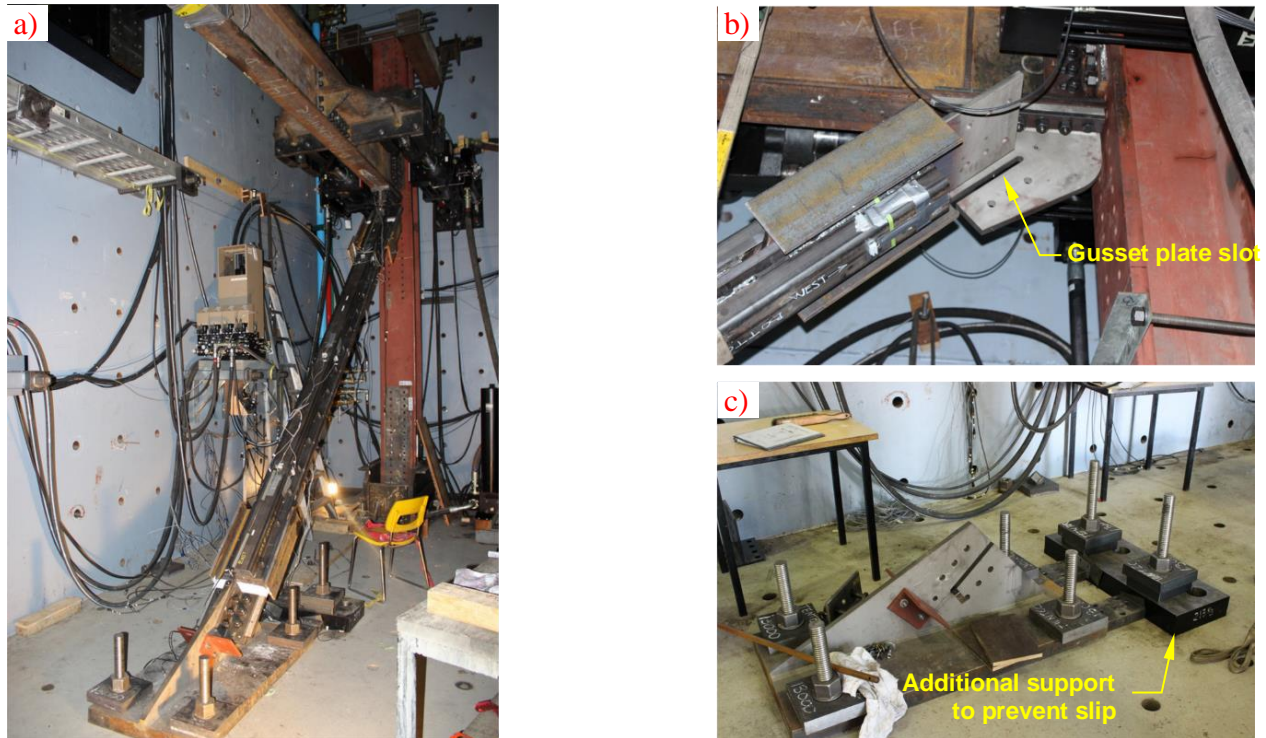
a) General view of the test setup (Specimen 6); b) Insertion of BRB into the upper gusset slot; and c) Anchorage of the lower gusset plate to the laboratory strong floor.
